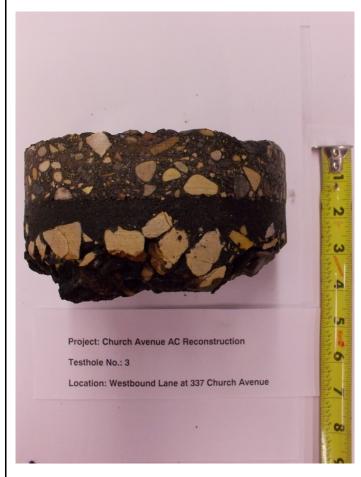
C03: Westbound lane at 337 Church Avenue, 1.5 m from curb
